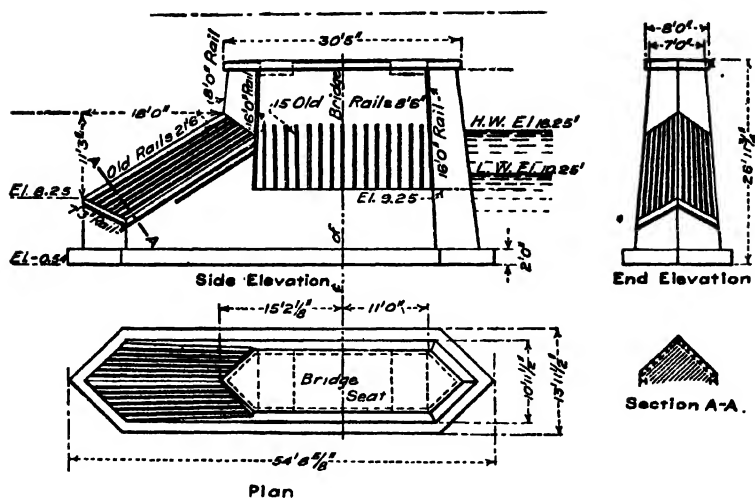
Pier with Ice-Breaking Cutwater. Flag Point Bridge of Copper River and Northwestern Railway, Alaska.
